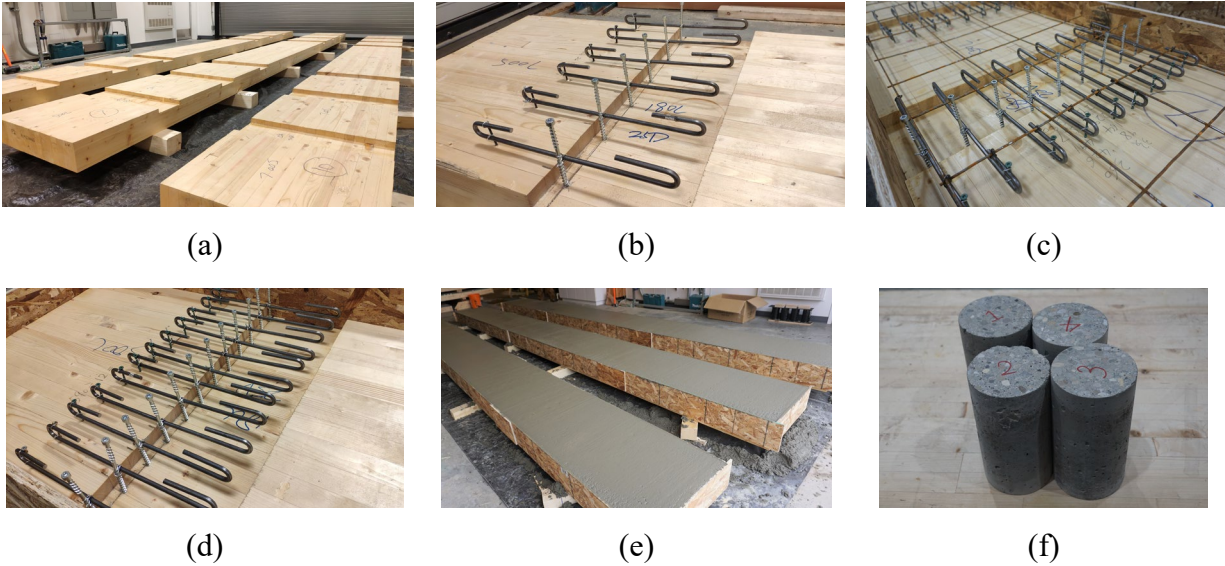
Reinforced composite floor specimen preparation (a) GLT panels with notches (b) Six rows of reinforcement in the notch (c) Nine rows of reinforcement in the notch and steel mesh (d) Twelve rows of reinforcement in the notch (e) Concrete casting and (f) Concrete cylinders
